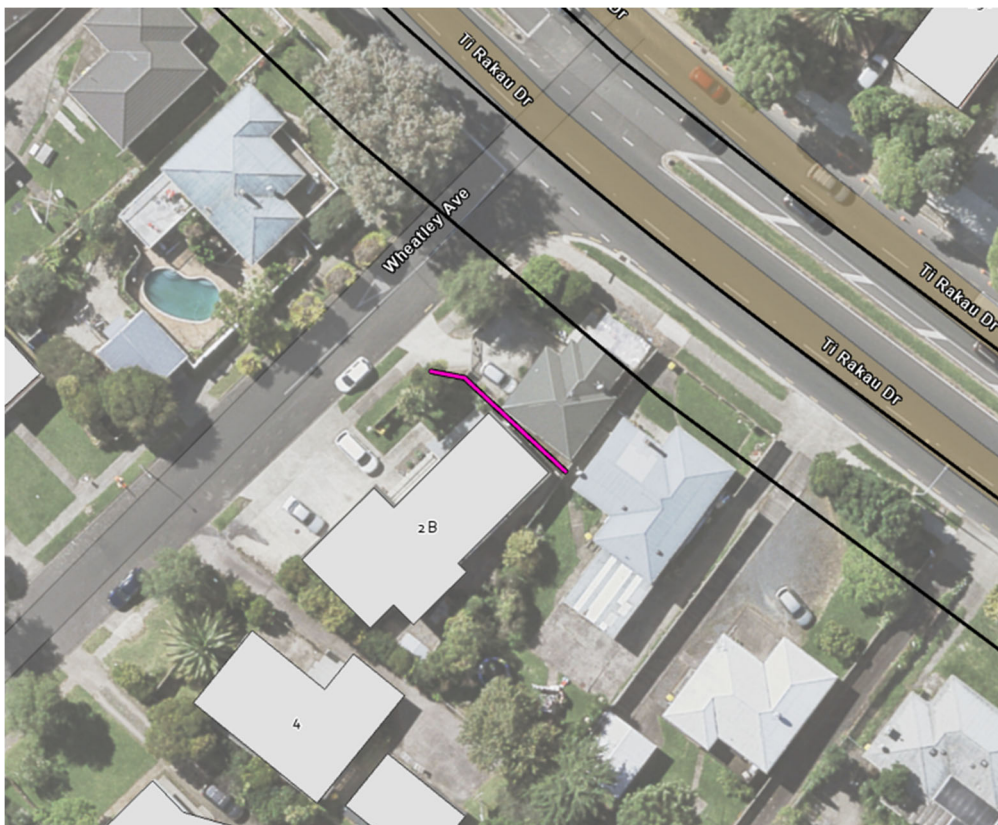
Proposed noise wall location - 2B Wheatley Avenue
